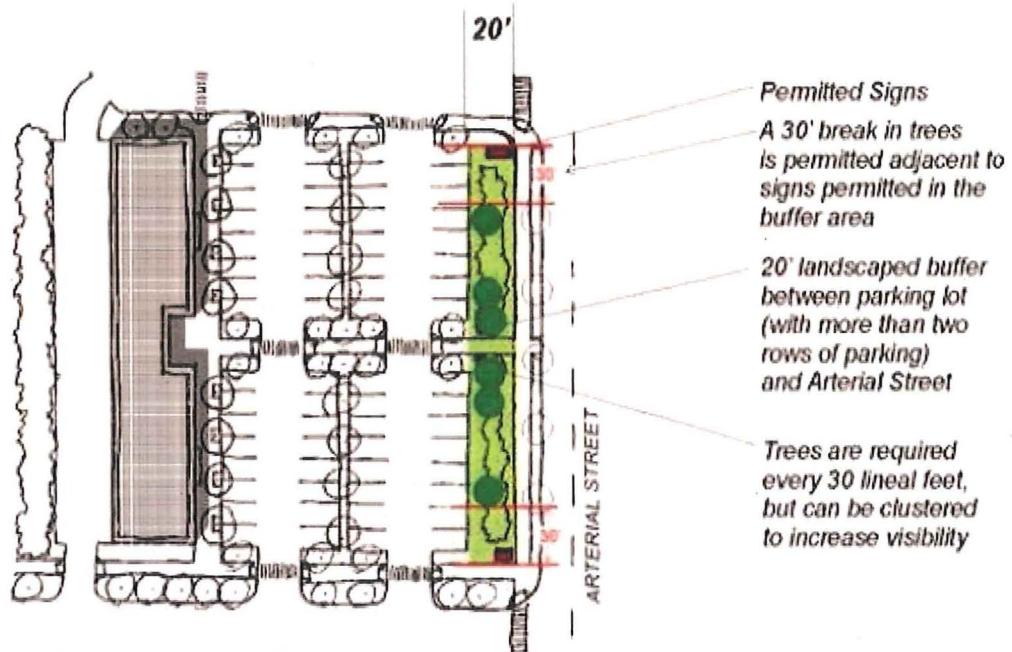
Landscaping between large parking lots and adjacent streets.
